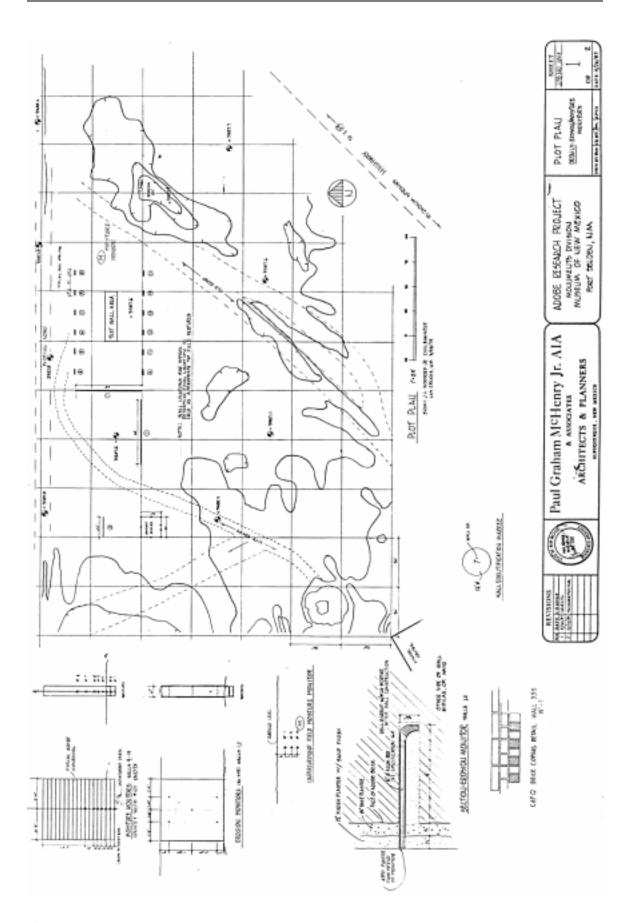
Site plan for the Fort Selden Adobe Test Wall Project - Phase I
